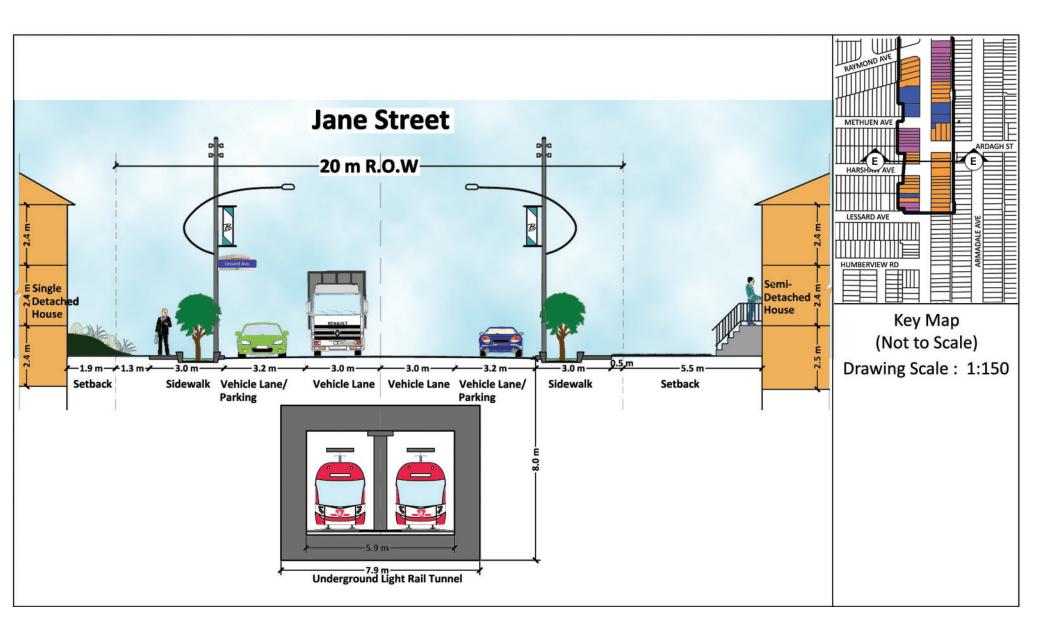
Jane Street Cross-section E (LRT Underground, Residential on Both Sides)
